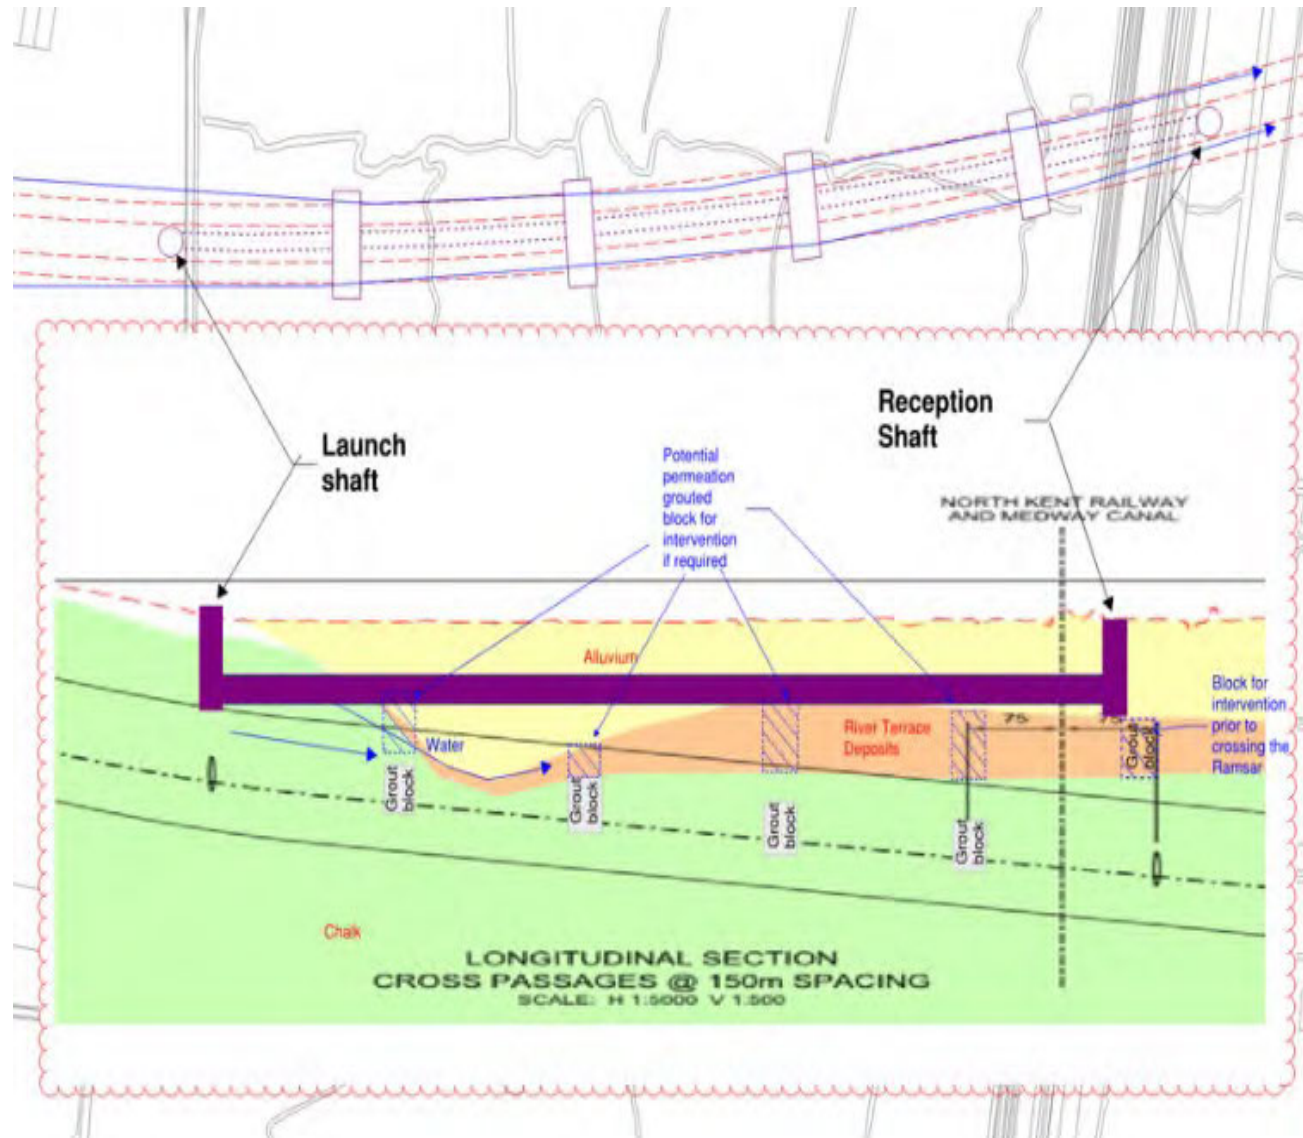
Ground protection tunnel and main tunnels alignment showing portals and grouting blocks
